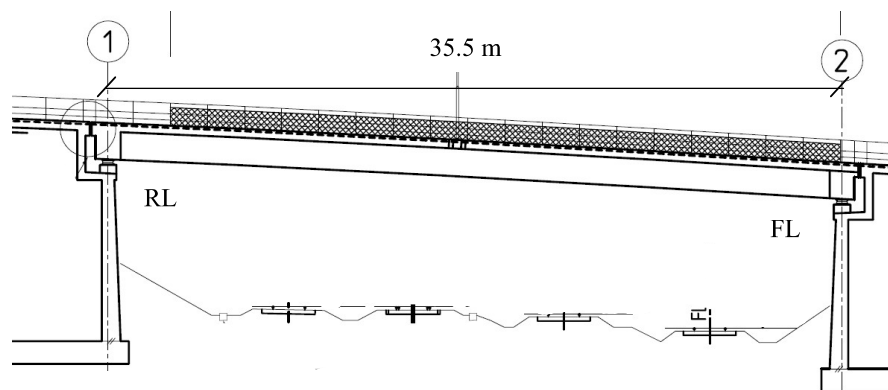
Elevation of Östrand road bridge, originally produced by Skanska.
